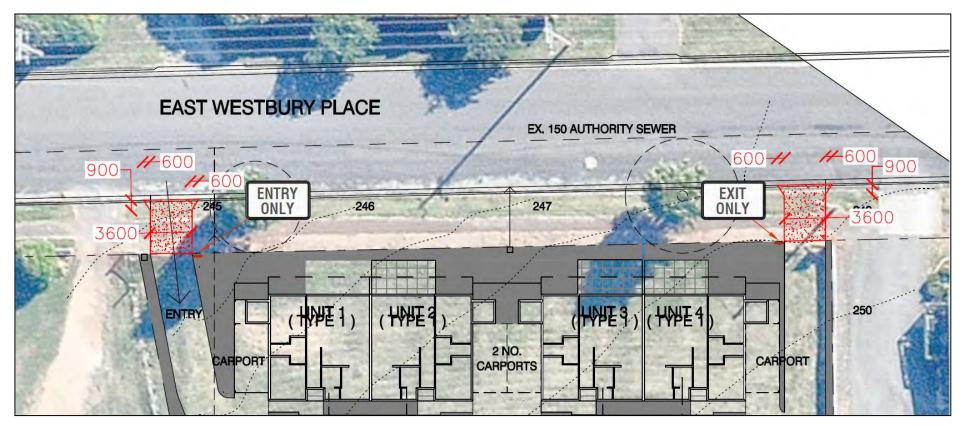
PROPOSED ACCESS CROSSOVER ARRANGEMENTS
